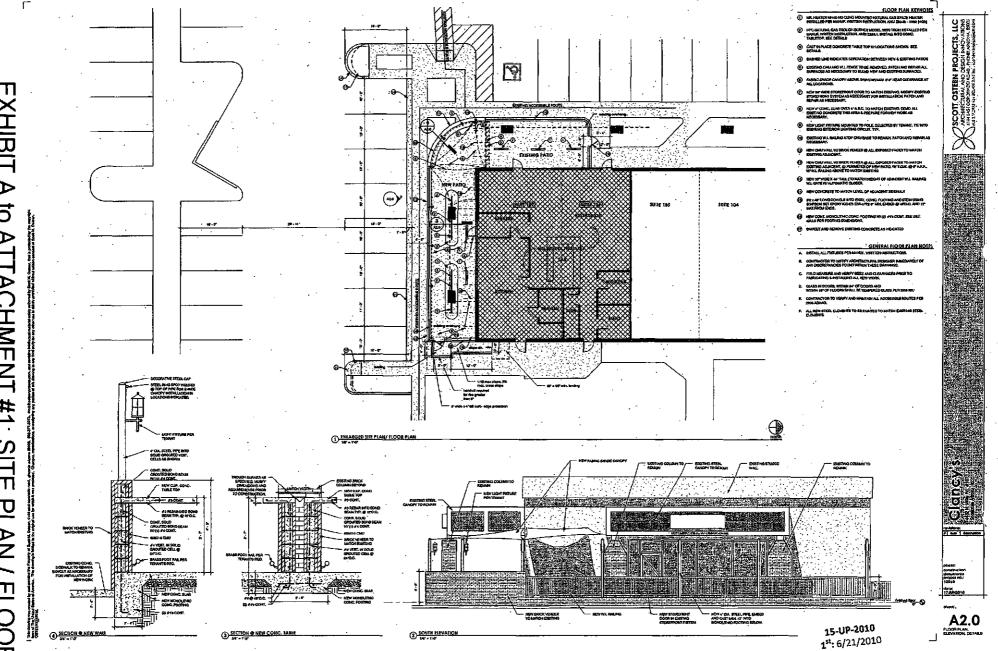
EXHIBIT A to ATTACHMENT #1: SITE PLAN / FLOOR PLAN
